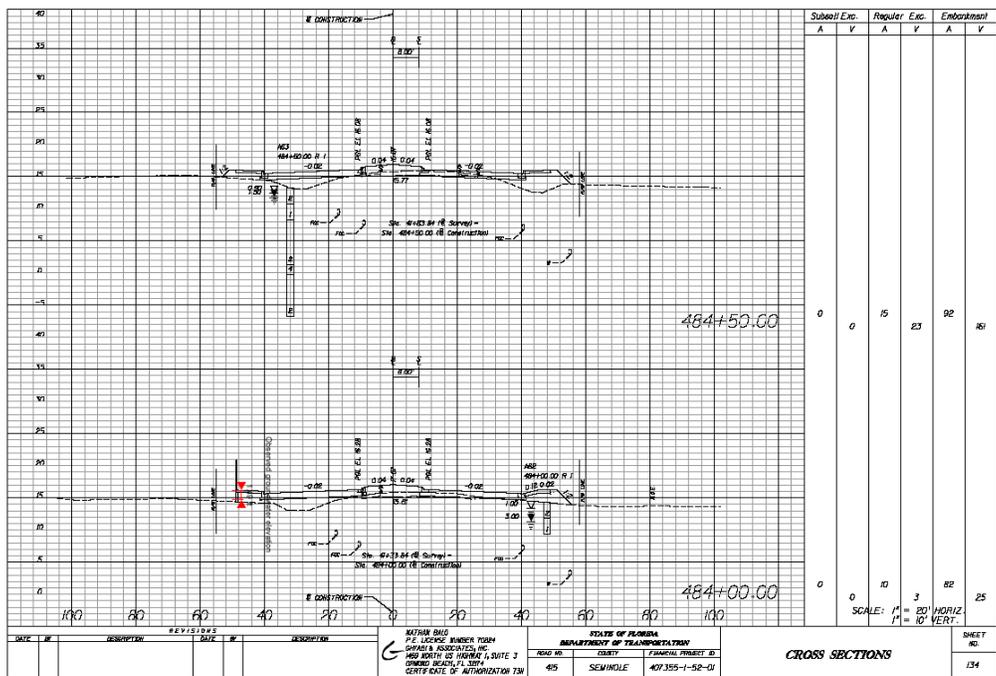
Cross section at Station 484+00 showing ground water measurement location from sidewalk grade at 1.49 feet below grade.
